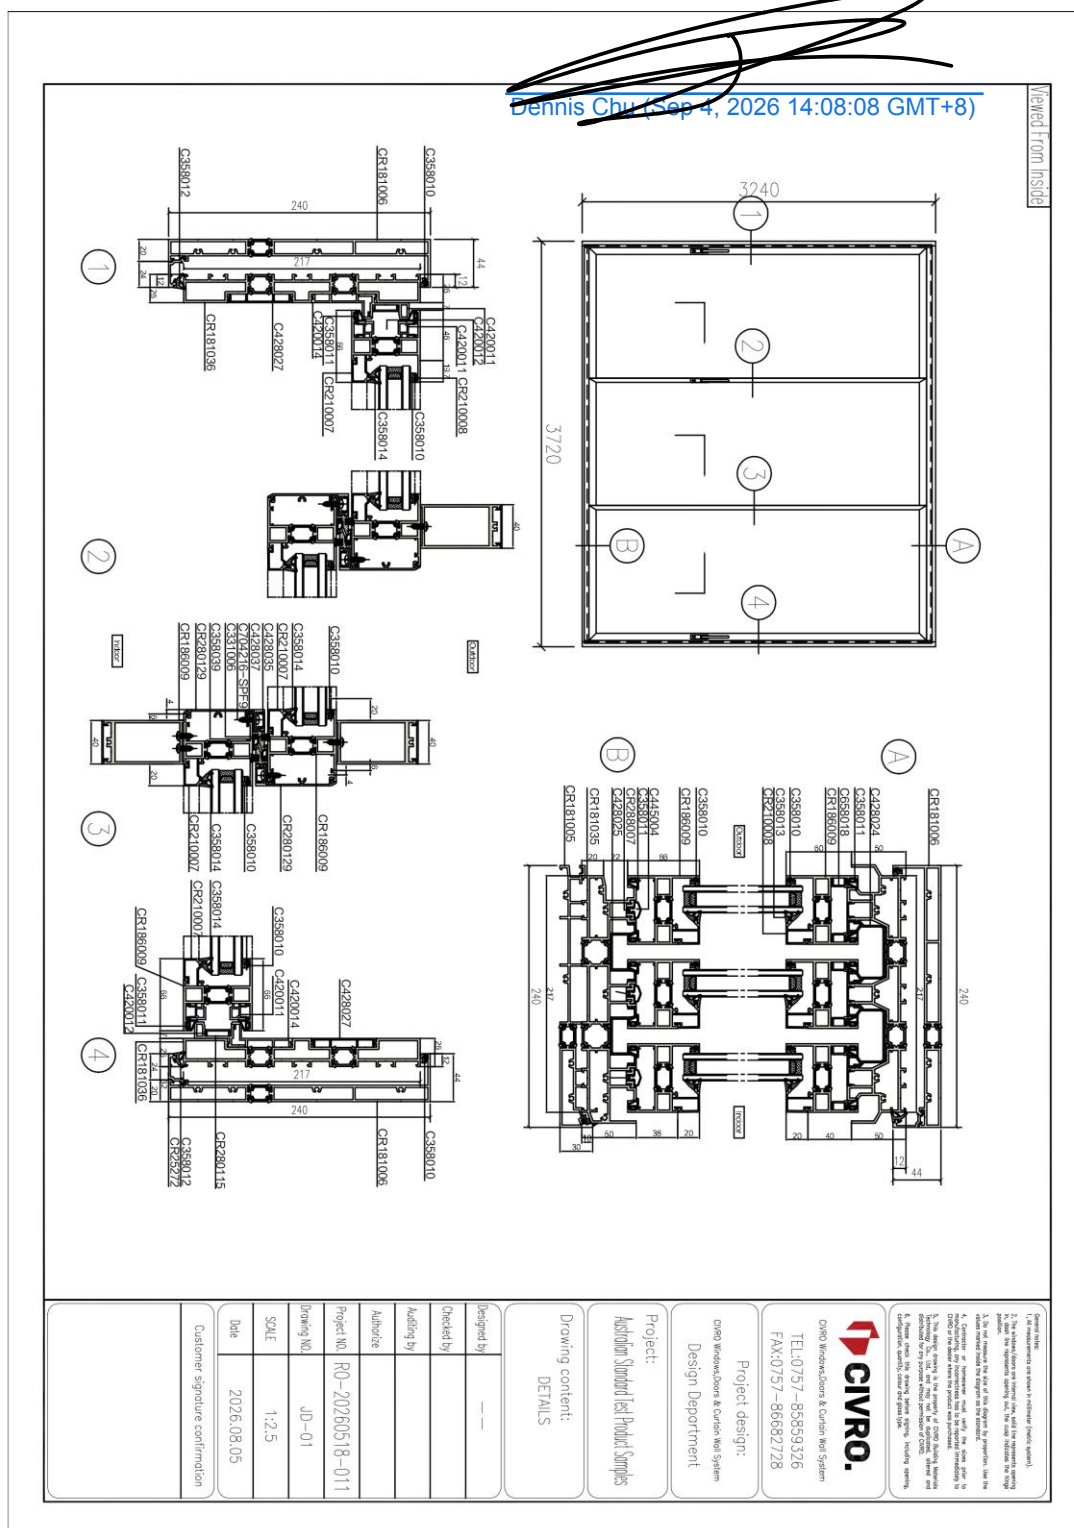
Drawing of Test Specimen Elevations and Test Specimen Cross Sections
